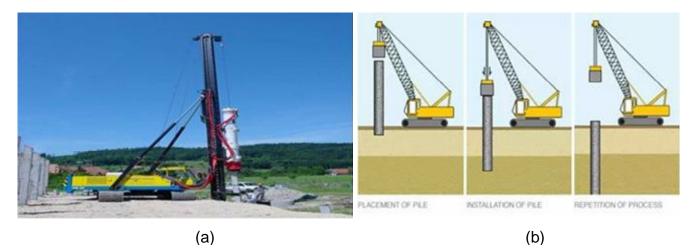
Pile driver: a) Drop weight hammer; b) Pile driving sequence.
